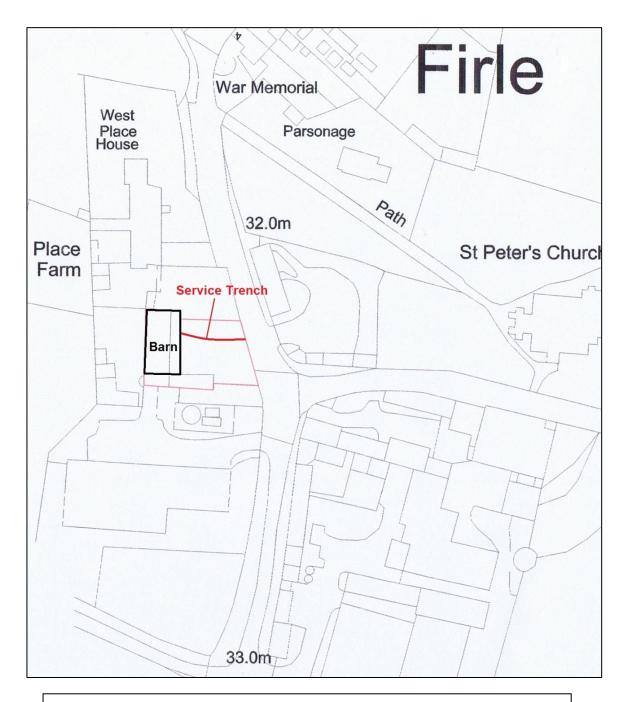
Place Farm, Firle: Plan showing location of Service Trench
